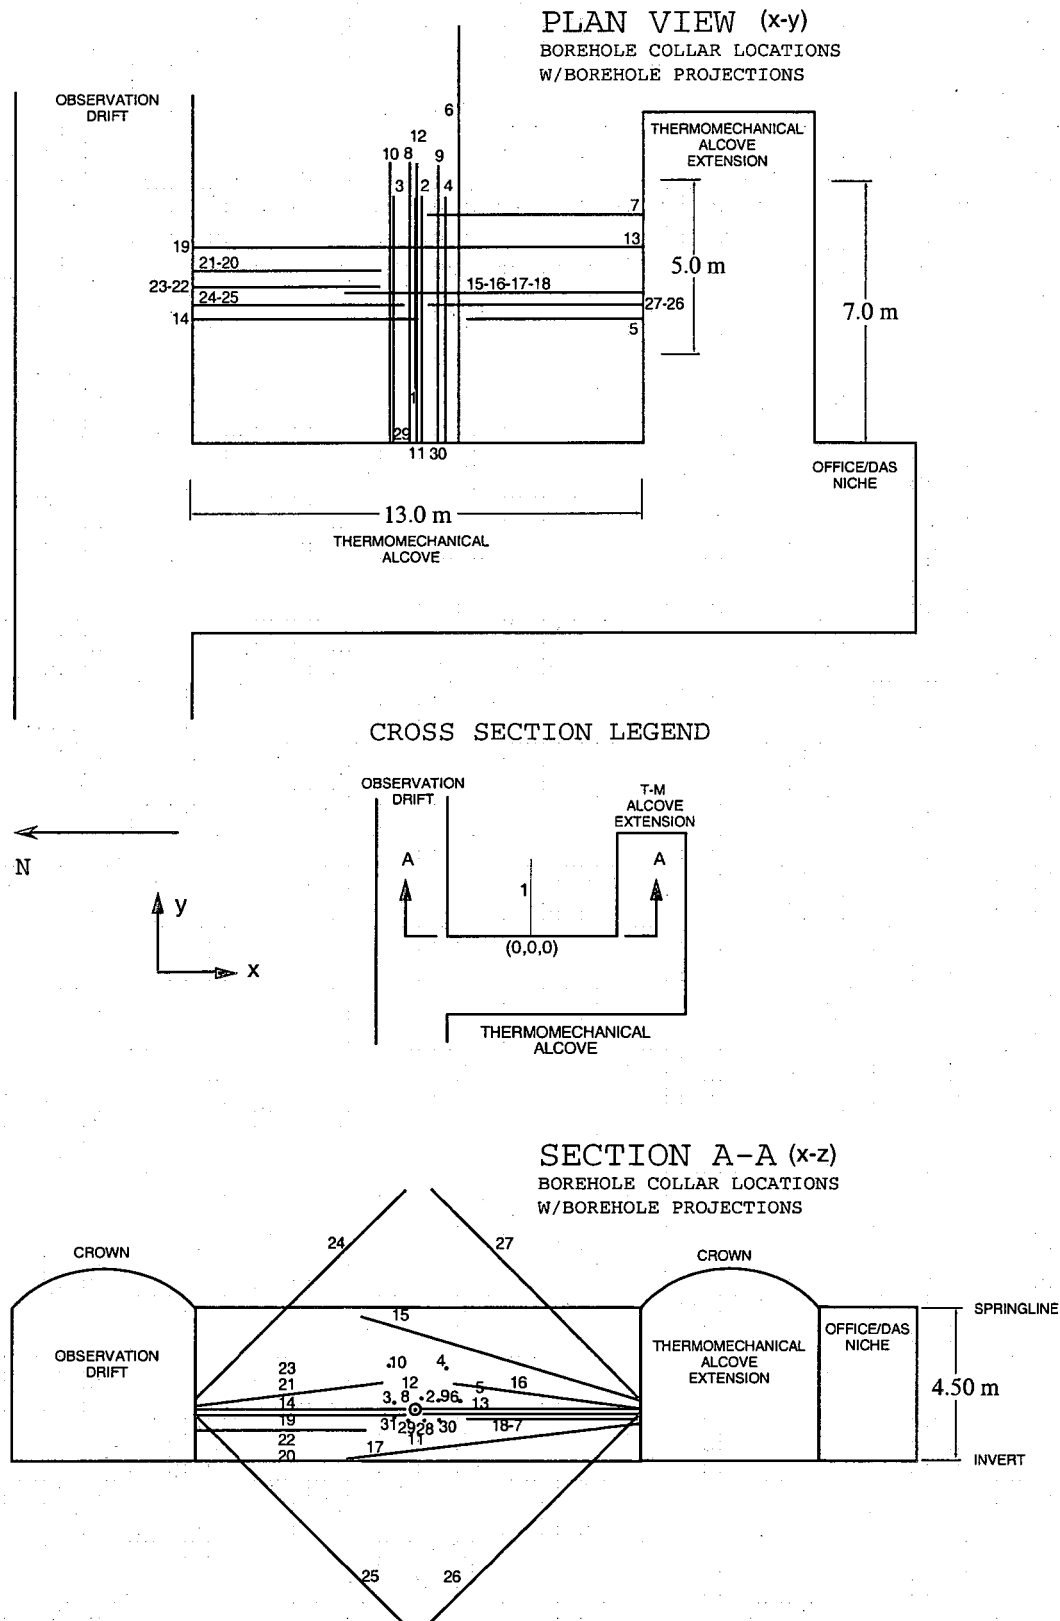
Borehole layout in the SHT (plan view and cross section).
